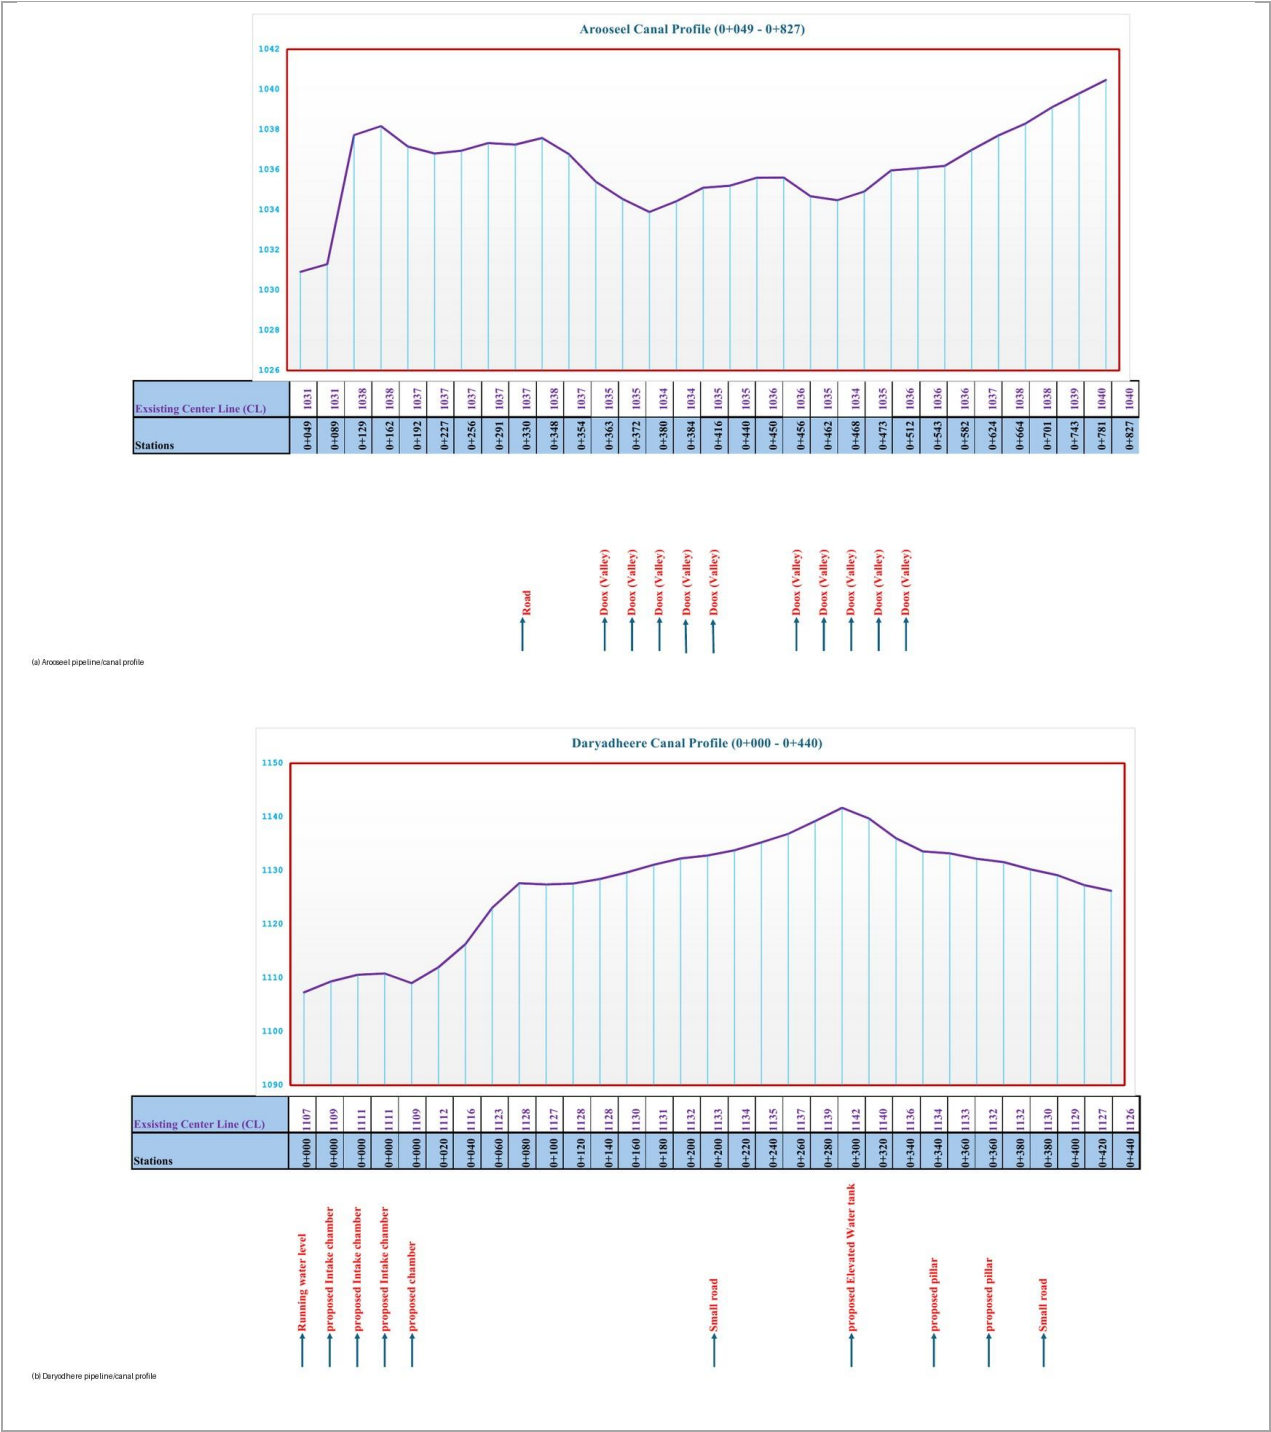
Arooseel and Daryodhere Pipeline Longitudinal Profiles and Typical Cross-Section
